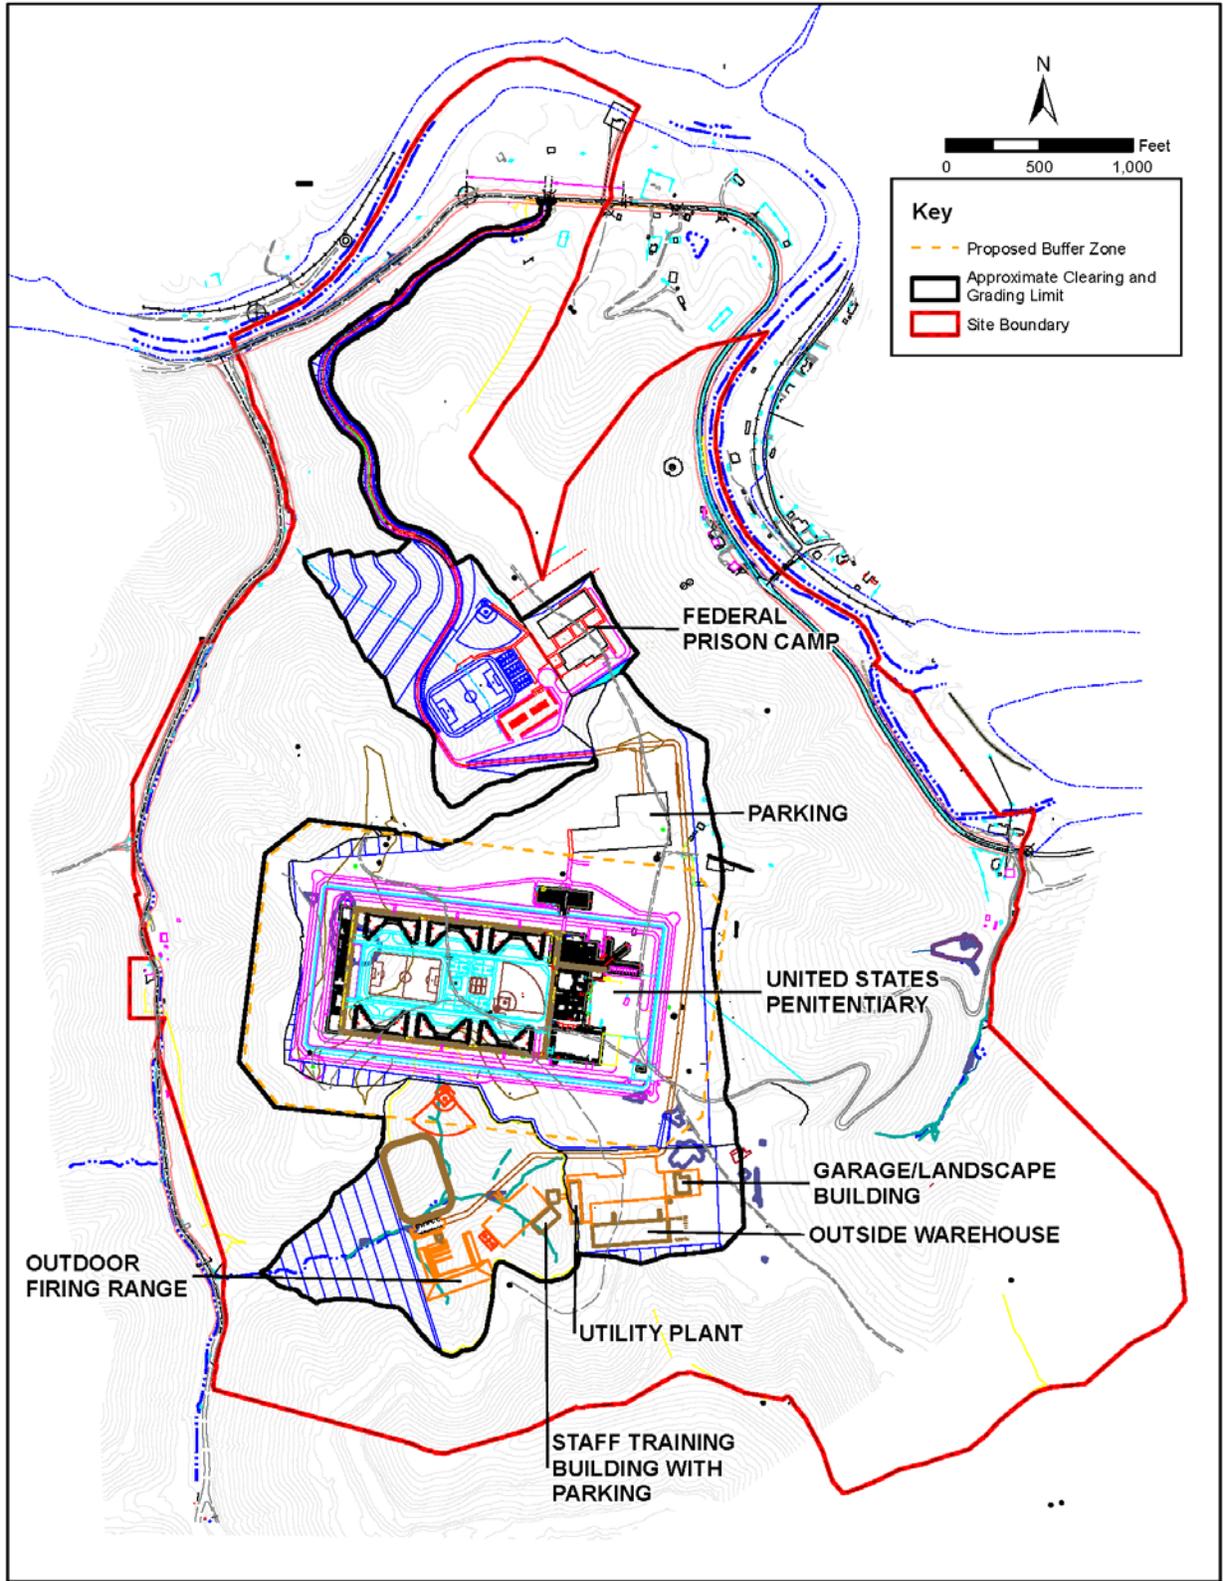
Conceptual Layout of Modified Alternative 2 – Roxana
